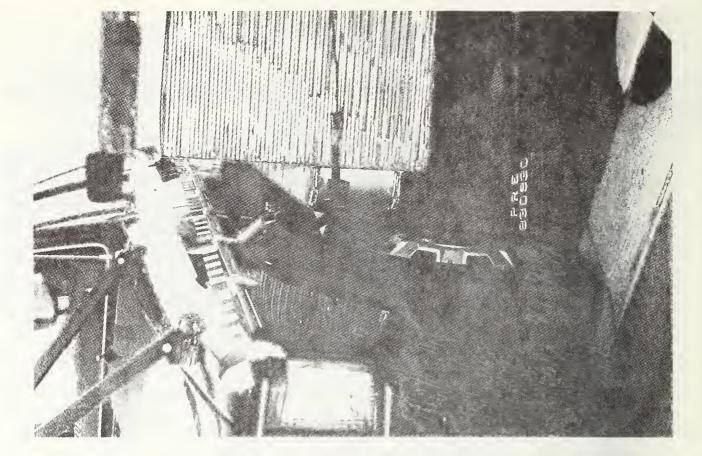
PRE-TEST CLOSEUP - VIEW 1
